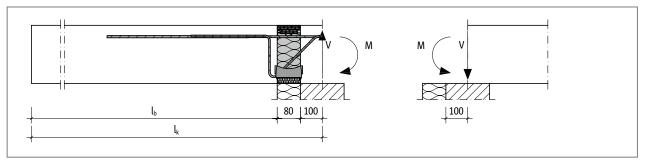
Schöck Isokorb® Type K Determined design section dimensions applied to floor slab
